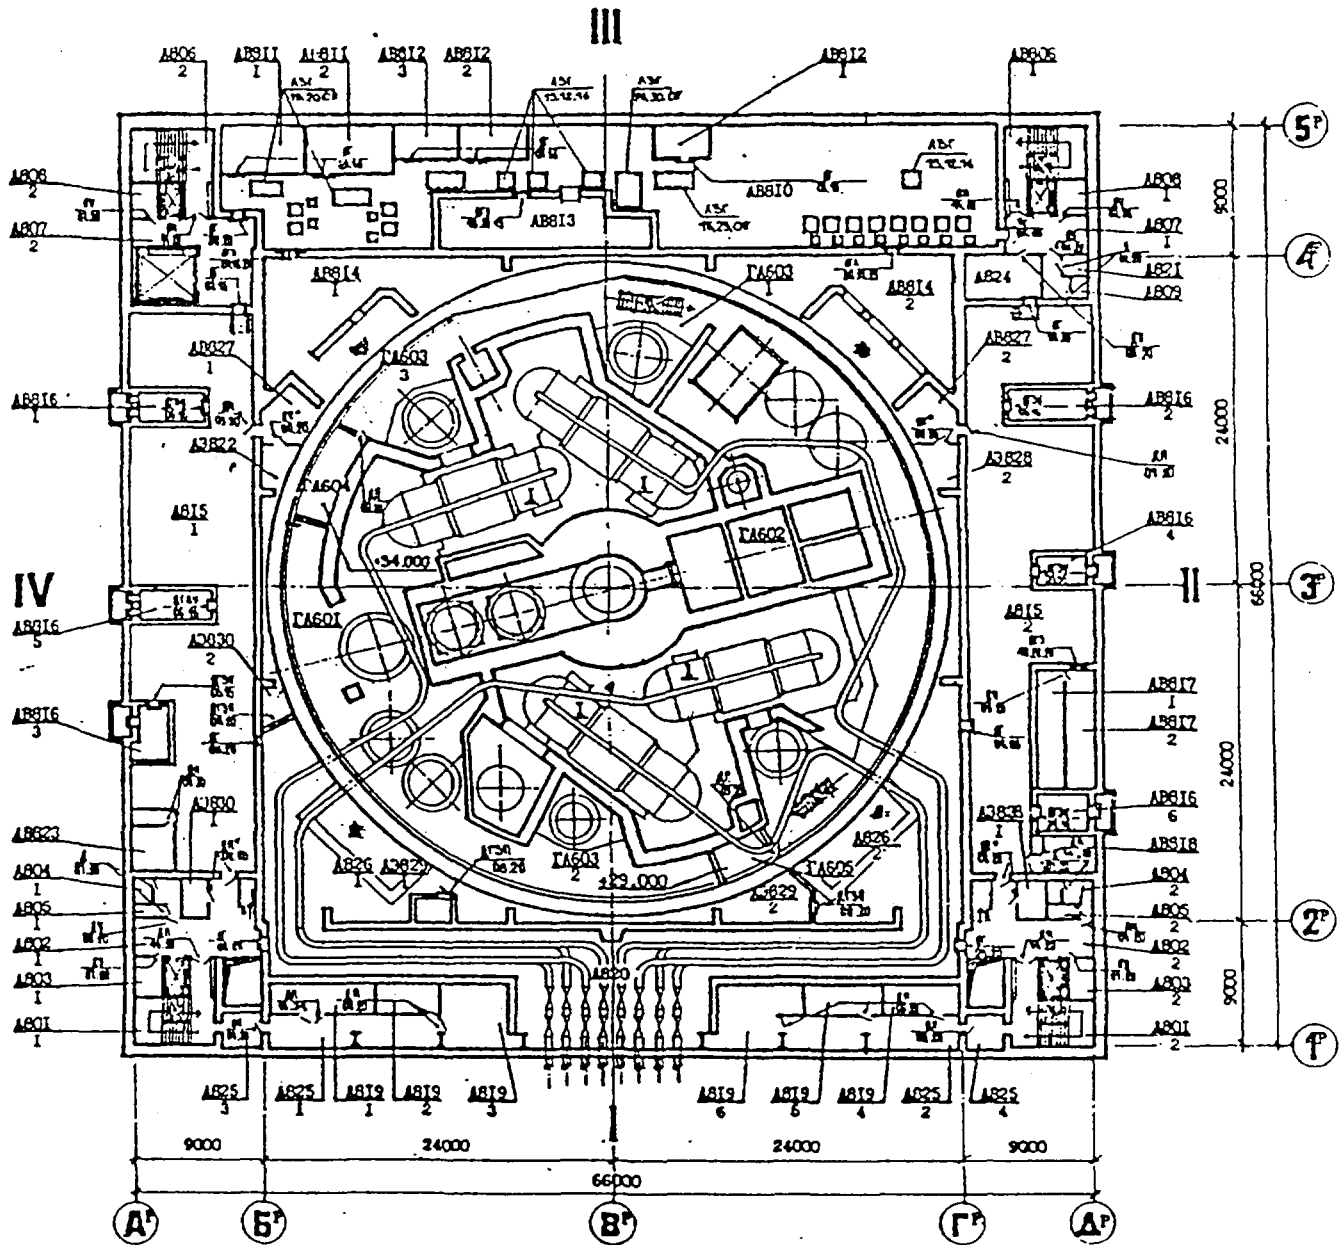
Plan View of WWER-1000 MW Reactor Building
